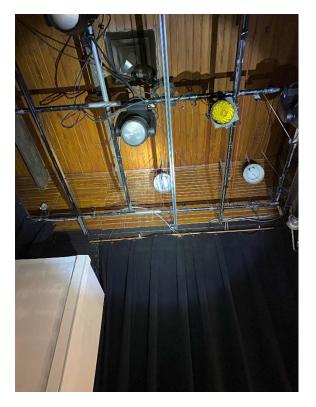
Water Stains near the Junction of Lower Roof and Main Roof
